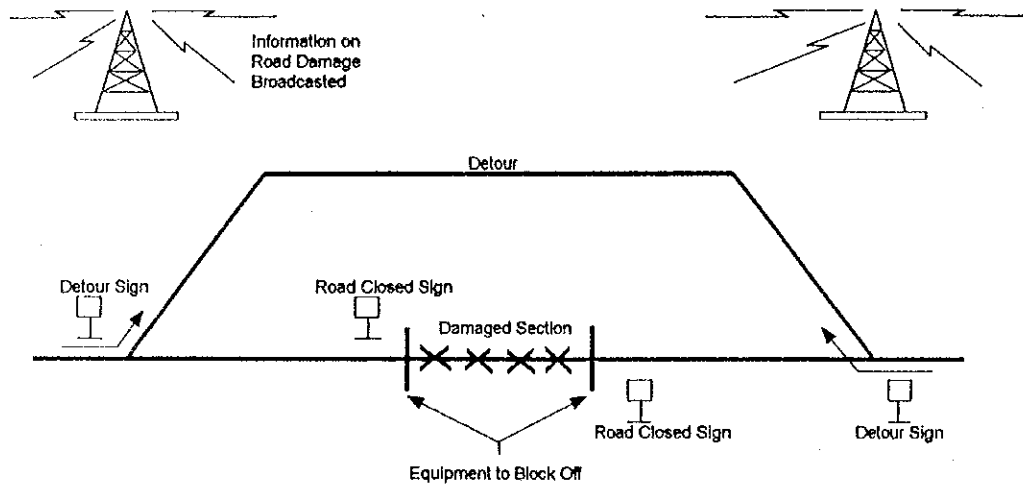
Presentation of Road Damage Information to Road Users
